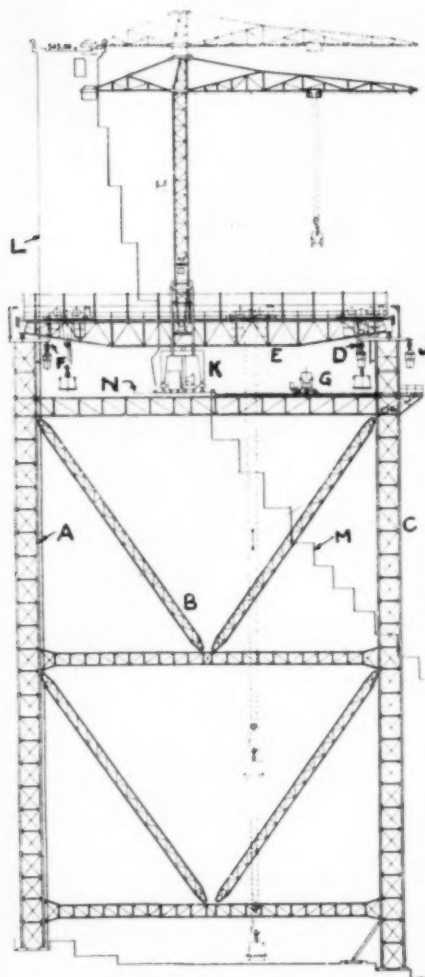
Bort Dam : Temporary Concreting Gantry.
